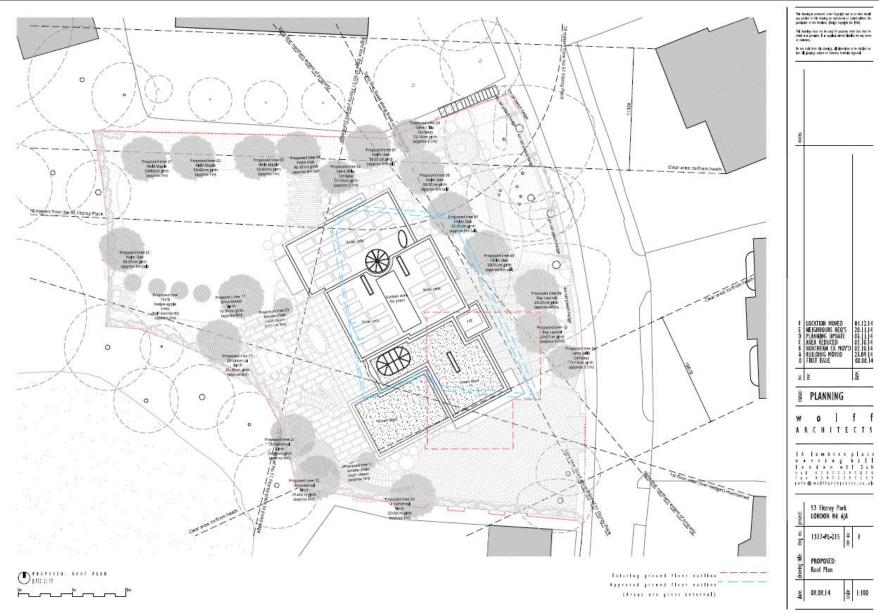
Roof Plan. No 1317-PL-215 Rev F. Wolff Architects (08.08.14)
